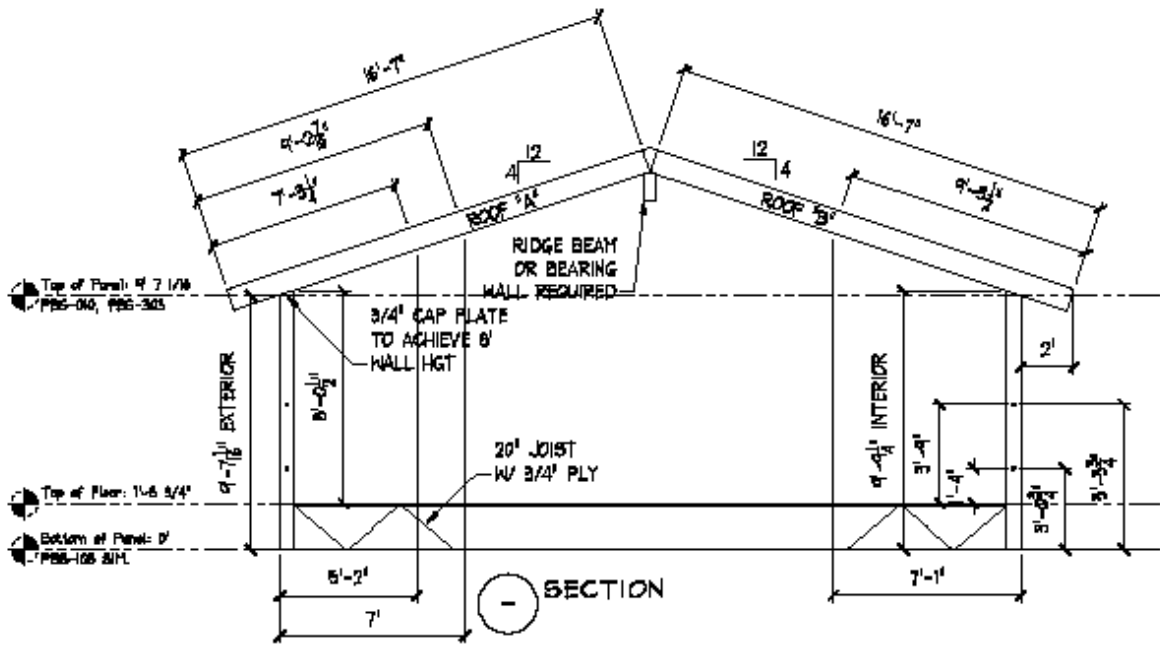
Shows basic section and structure requirements. The extended overhangs are SIPs and this has substantial labor savings compared to site assembled roof extensions.
